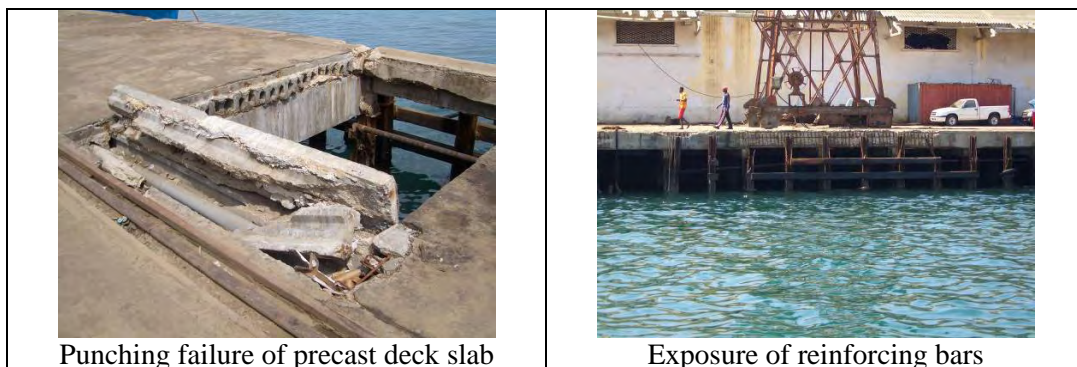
Damaged Condition of the Cabotage Terminal -1
